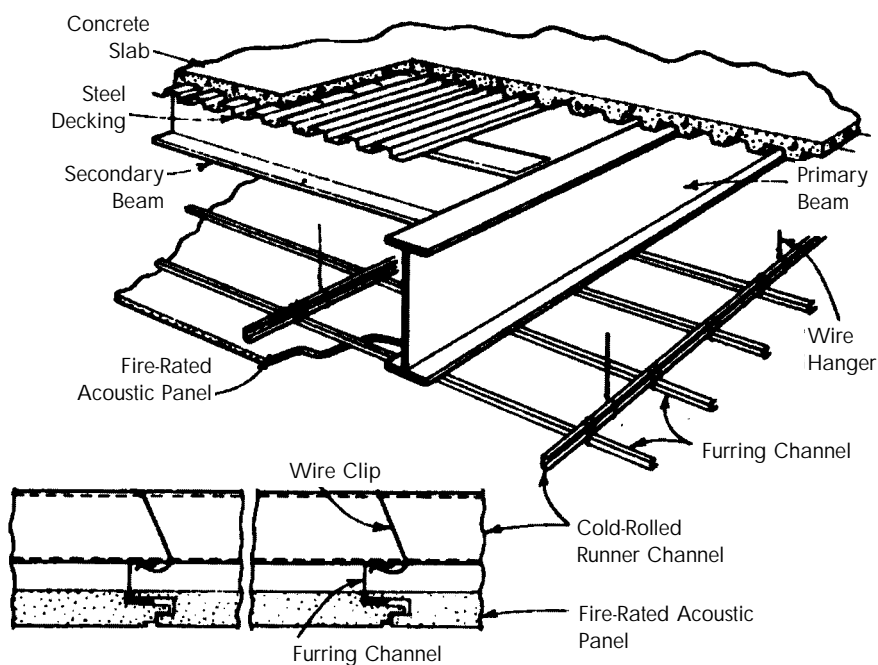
Steel floor system fire protected on the underside by a suspended ceiling. Illustration courtesy of the American Iron and Steel Institute, *Designing Fire Protection for Steel Beams*.
